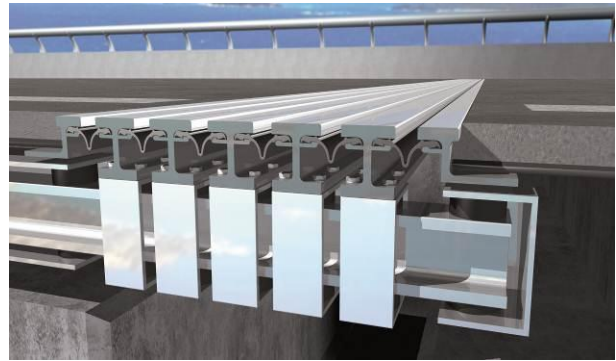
Schematic section of a 6-gap modular joint. The lamella beams on the surface slide along support bars, which span between boxes at each side of the movement gap
